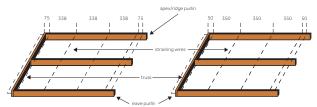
Diagram A – 150mm sidelap joint. Straining wire central to overlapping.
